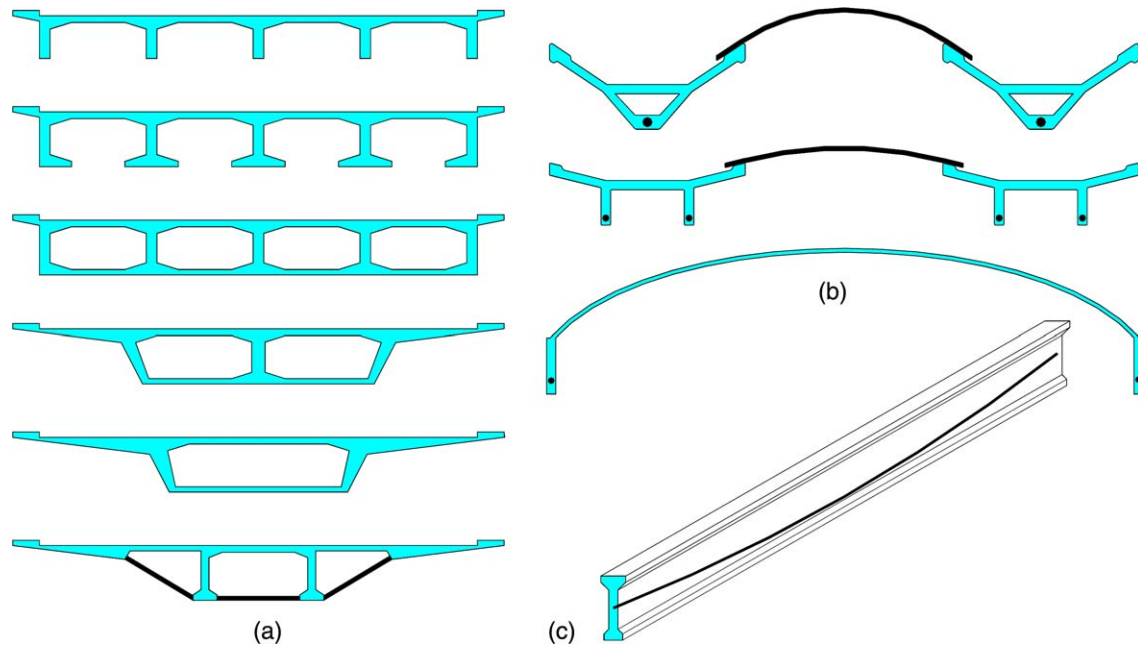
Some examples of structures for which both the geometry and the material properties can be considered constants along a main direction. (a) Bridge decks with prestressed girders and box-girder bridges; (b) Prestressed prismatic and cylindrical shell roofs; (c) Prestressed thin-walled beams.
